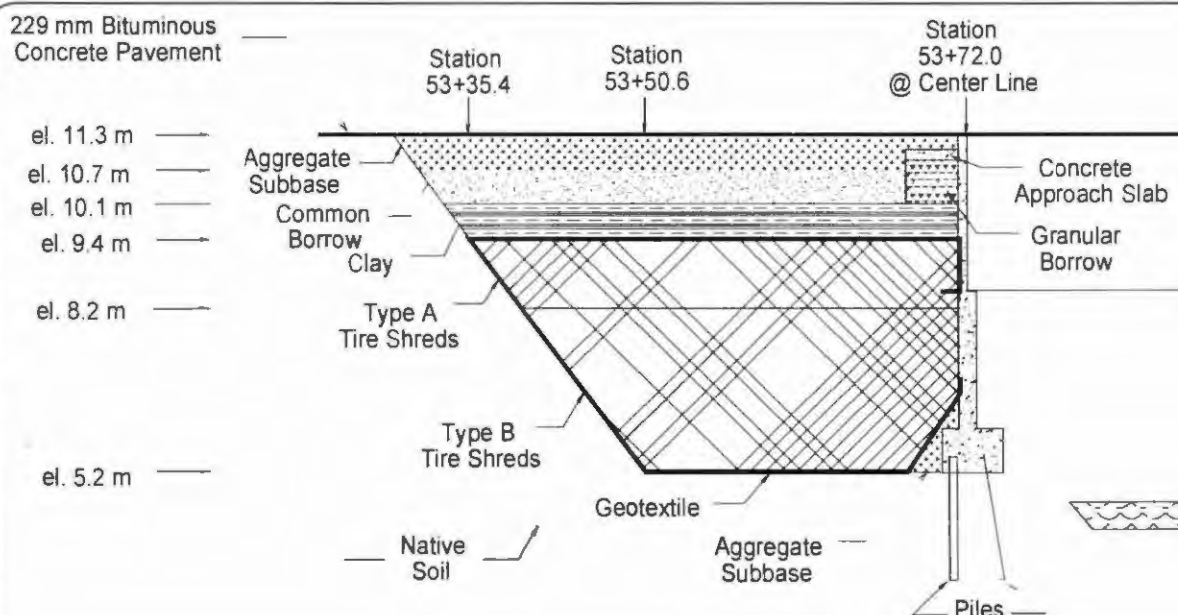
Longitudinal section through North Abutment TDA fill
